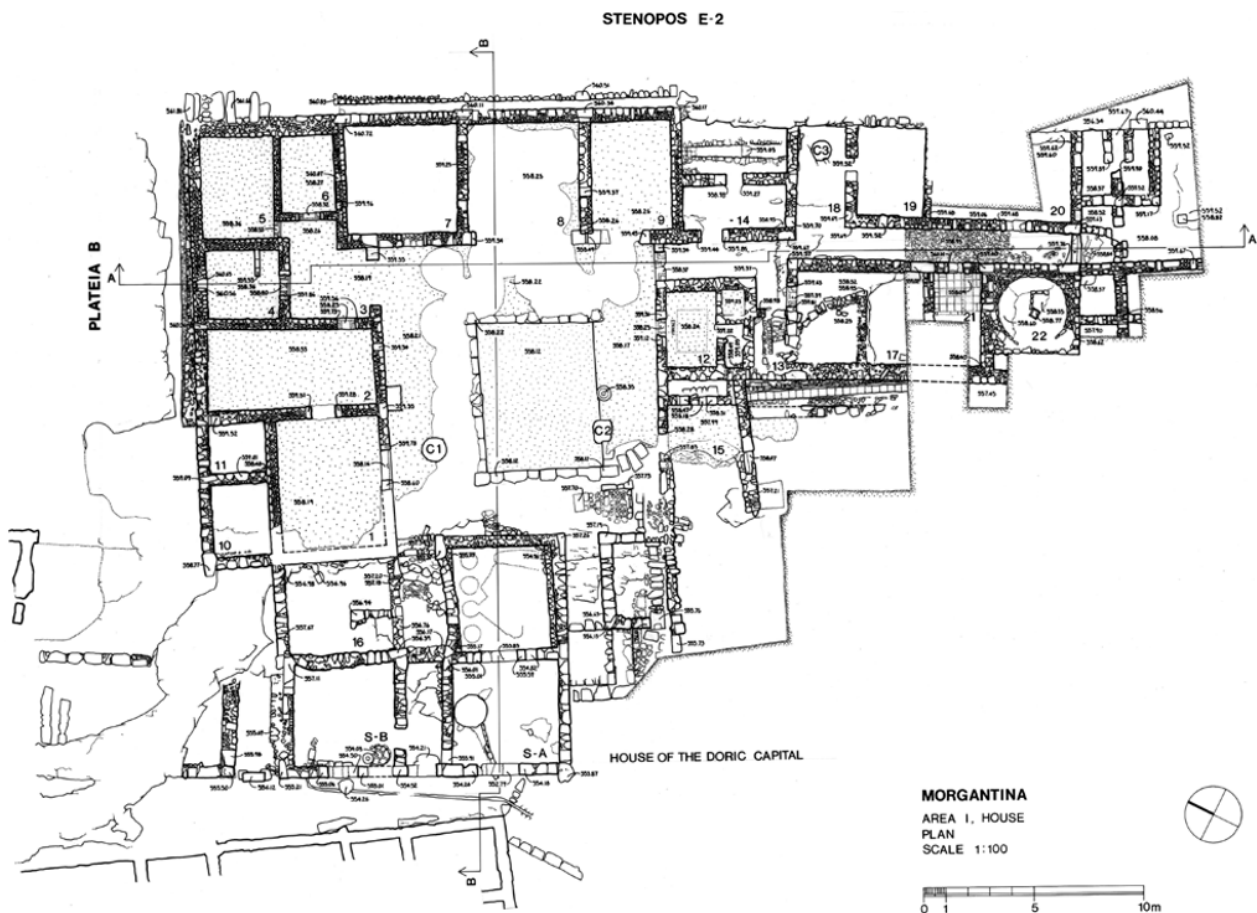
House of the Doric Capital, Morgantina, plan. *Source:* American Excavations at Morgantina.
